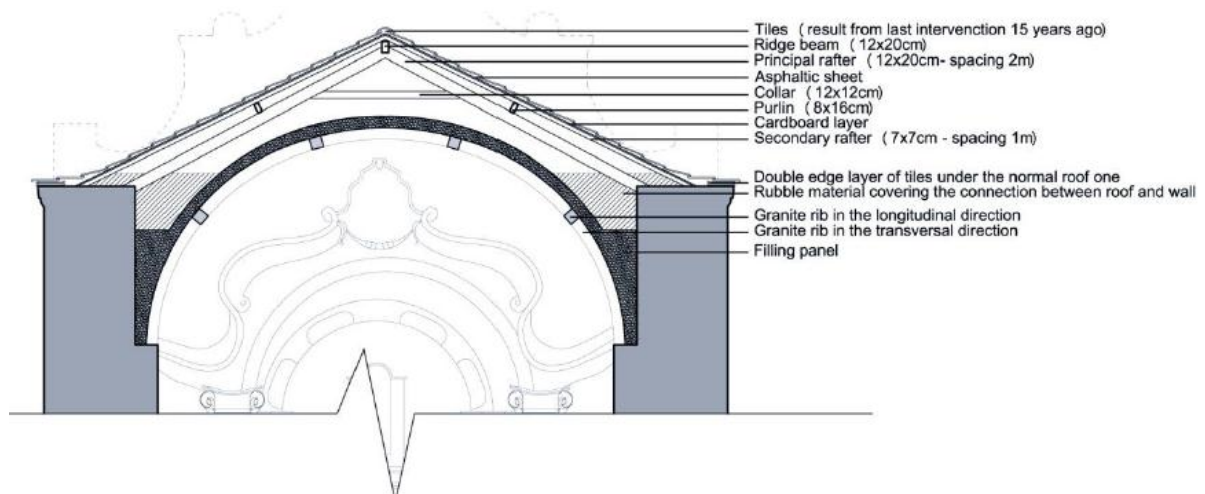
Section of the wooden roof structure (Betzer et al., 2014).
